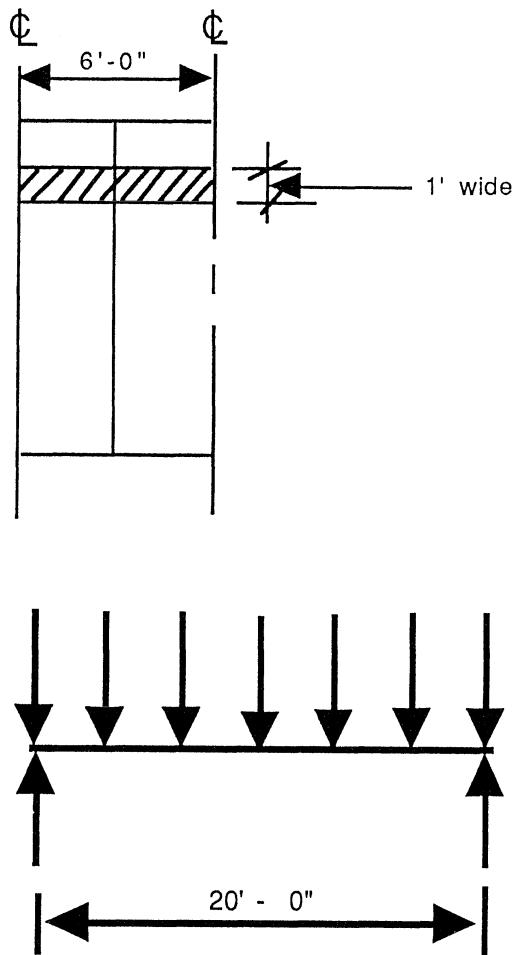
Typical beam. (a) Loading strip; (b) simply supported beam.
